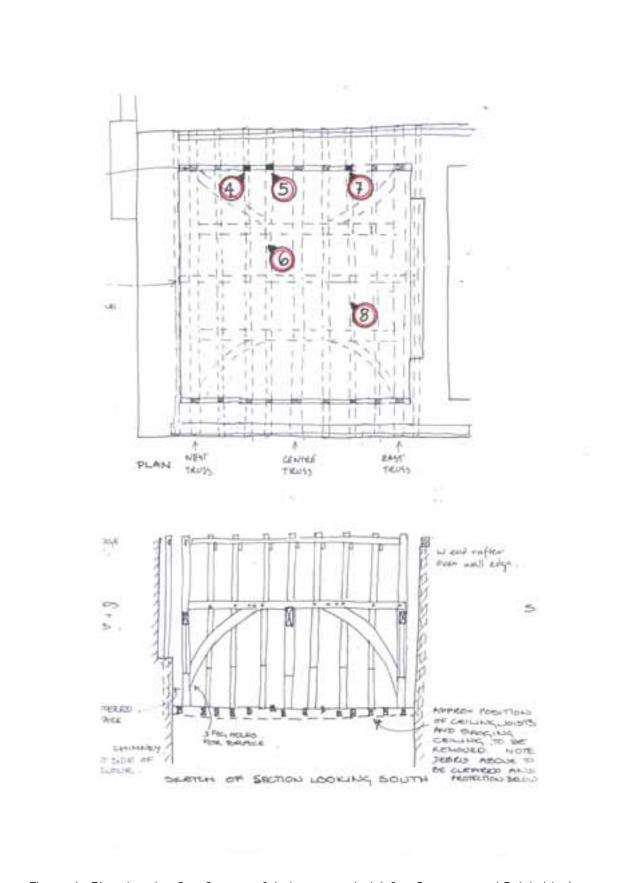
Plan showing first-floor roof timbers sampled (after Seymour and Bainbridge)
